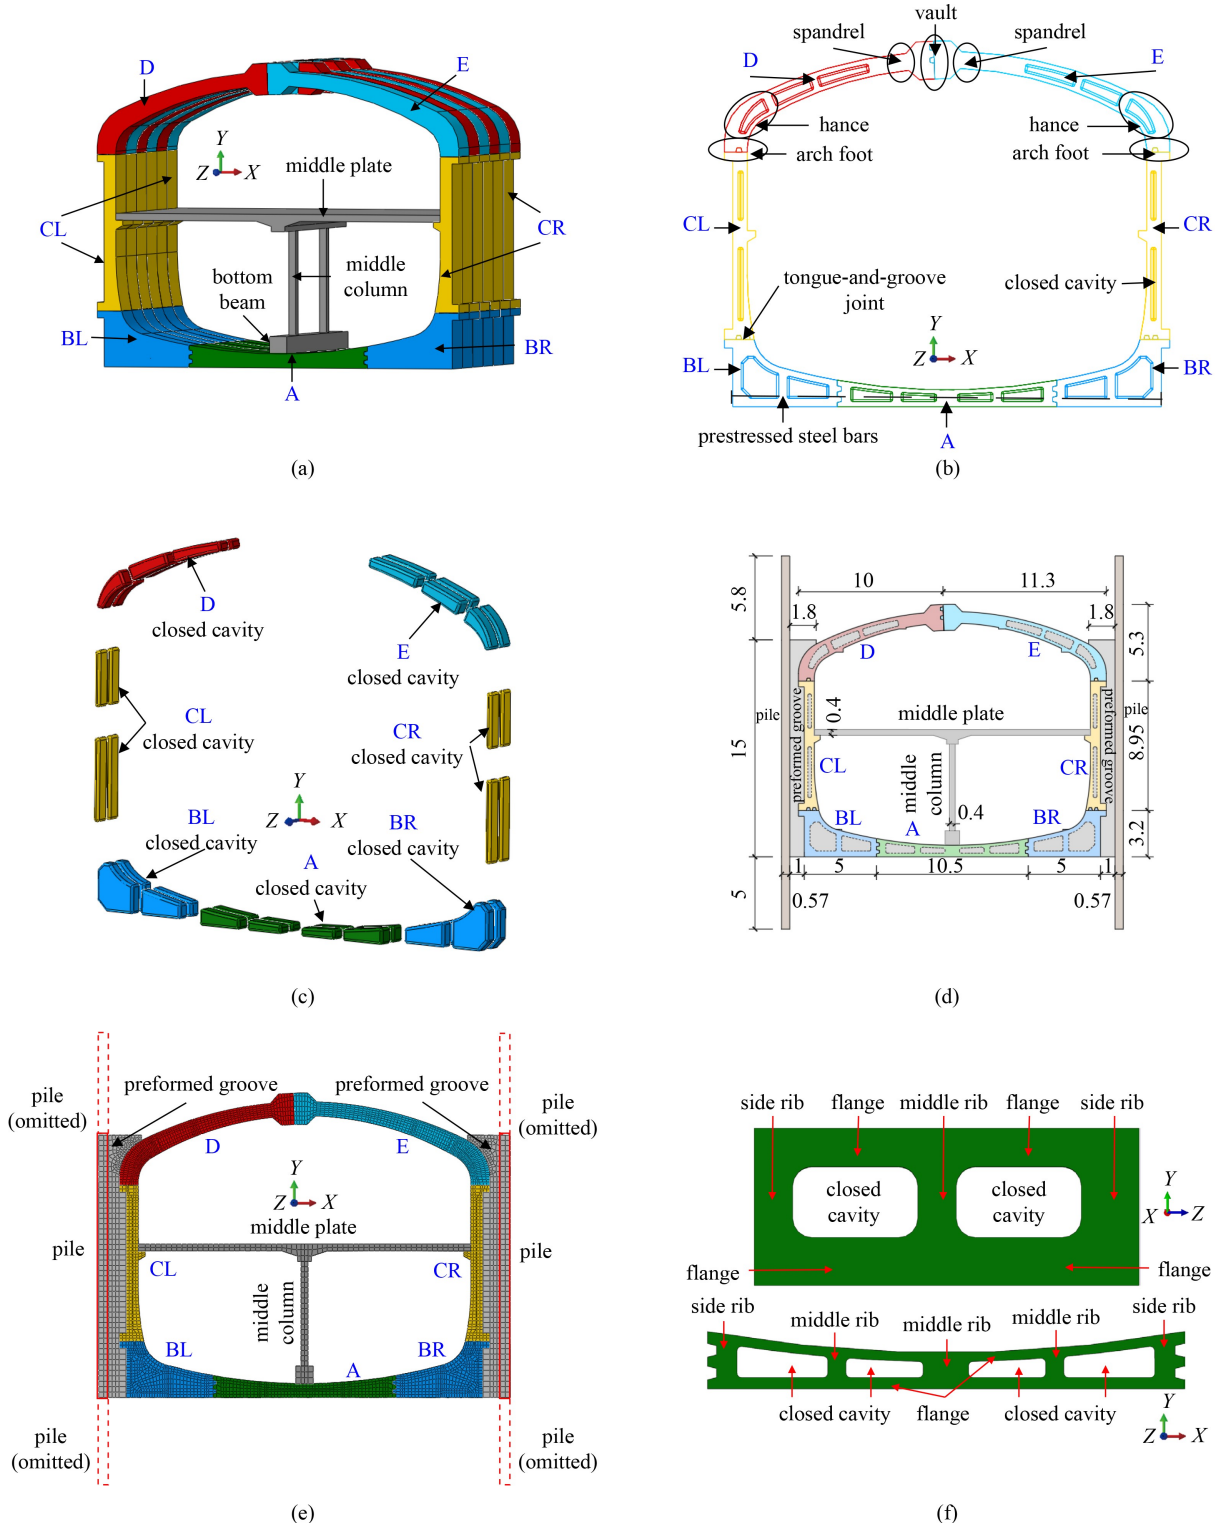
Notes and details of the PSSS: (a) prefabricated components; (b) perspective view; (c) setting of closed cavities; (d) dimensional drawing (unit: m); (e) 3D FEM; (f) thin-walled component.
